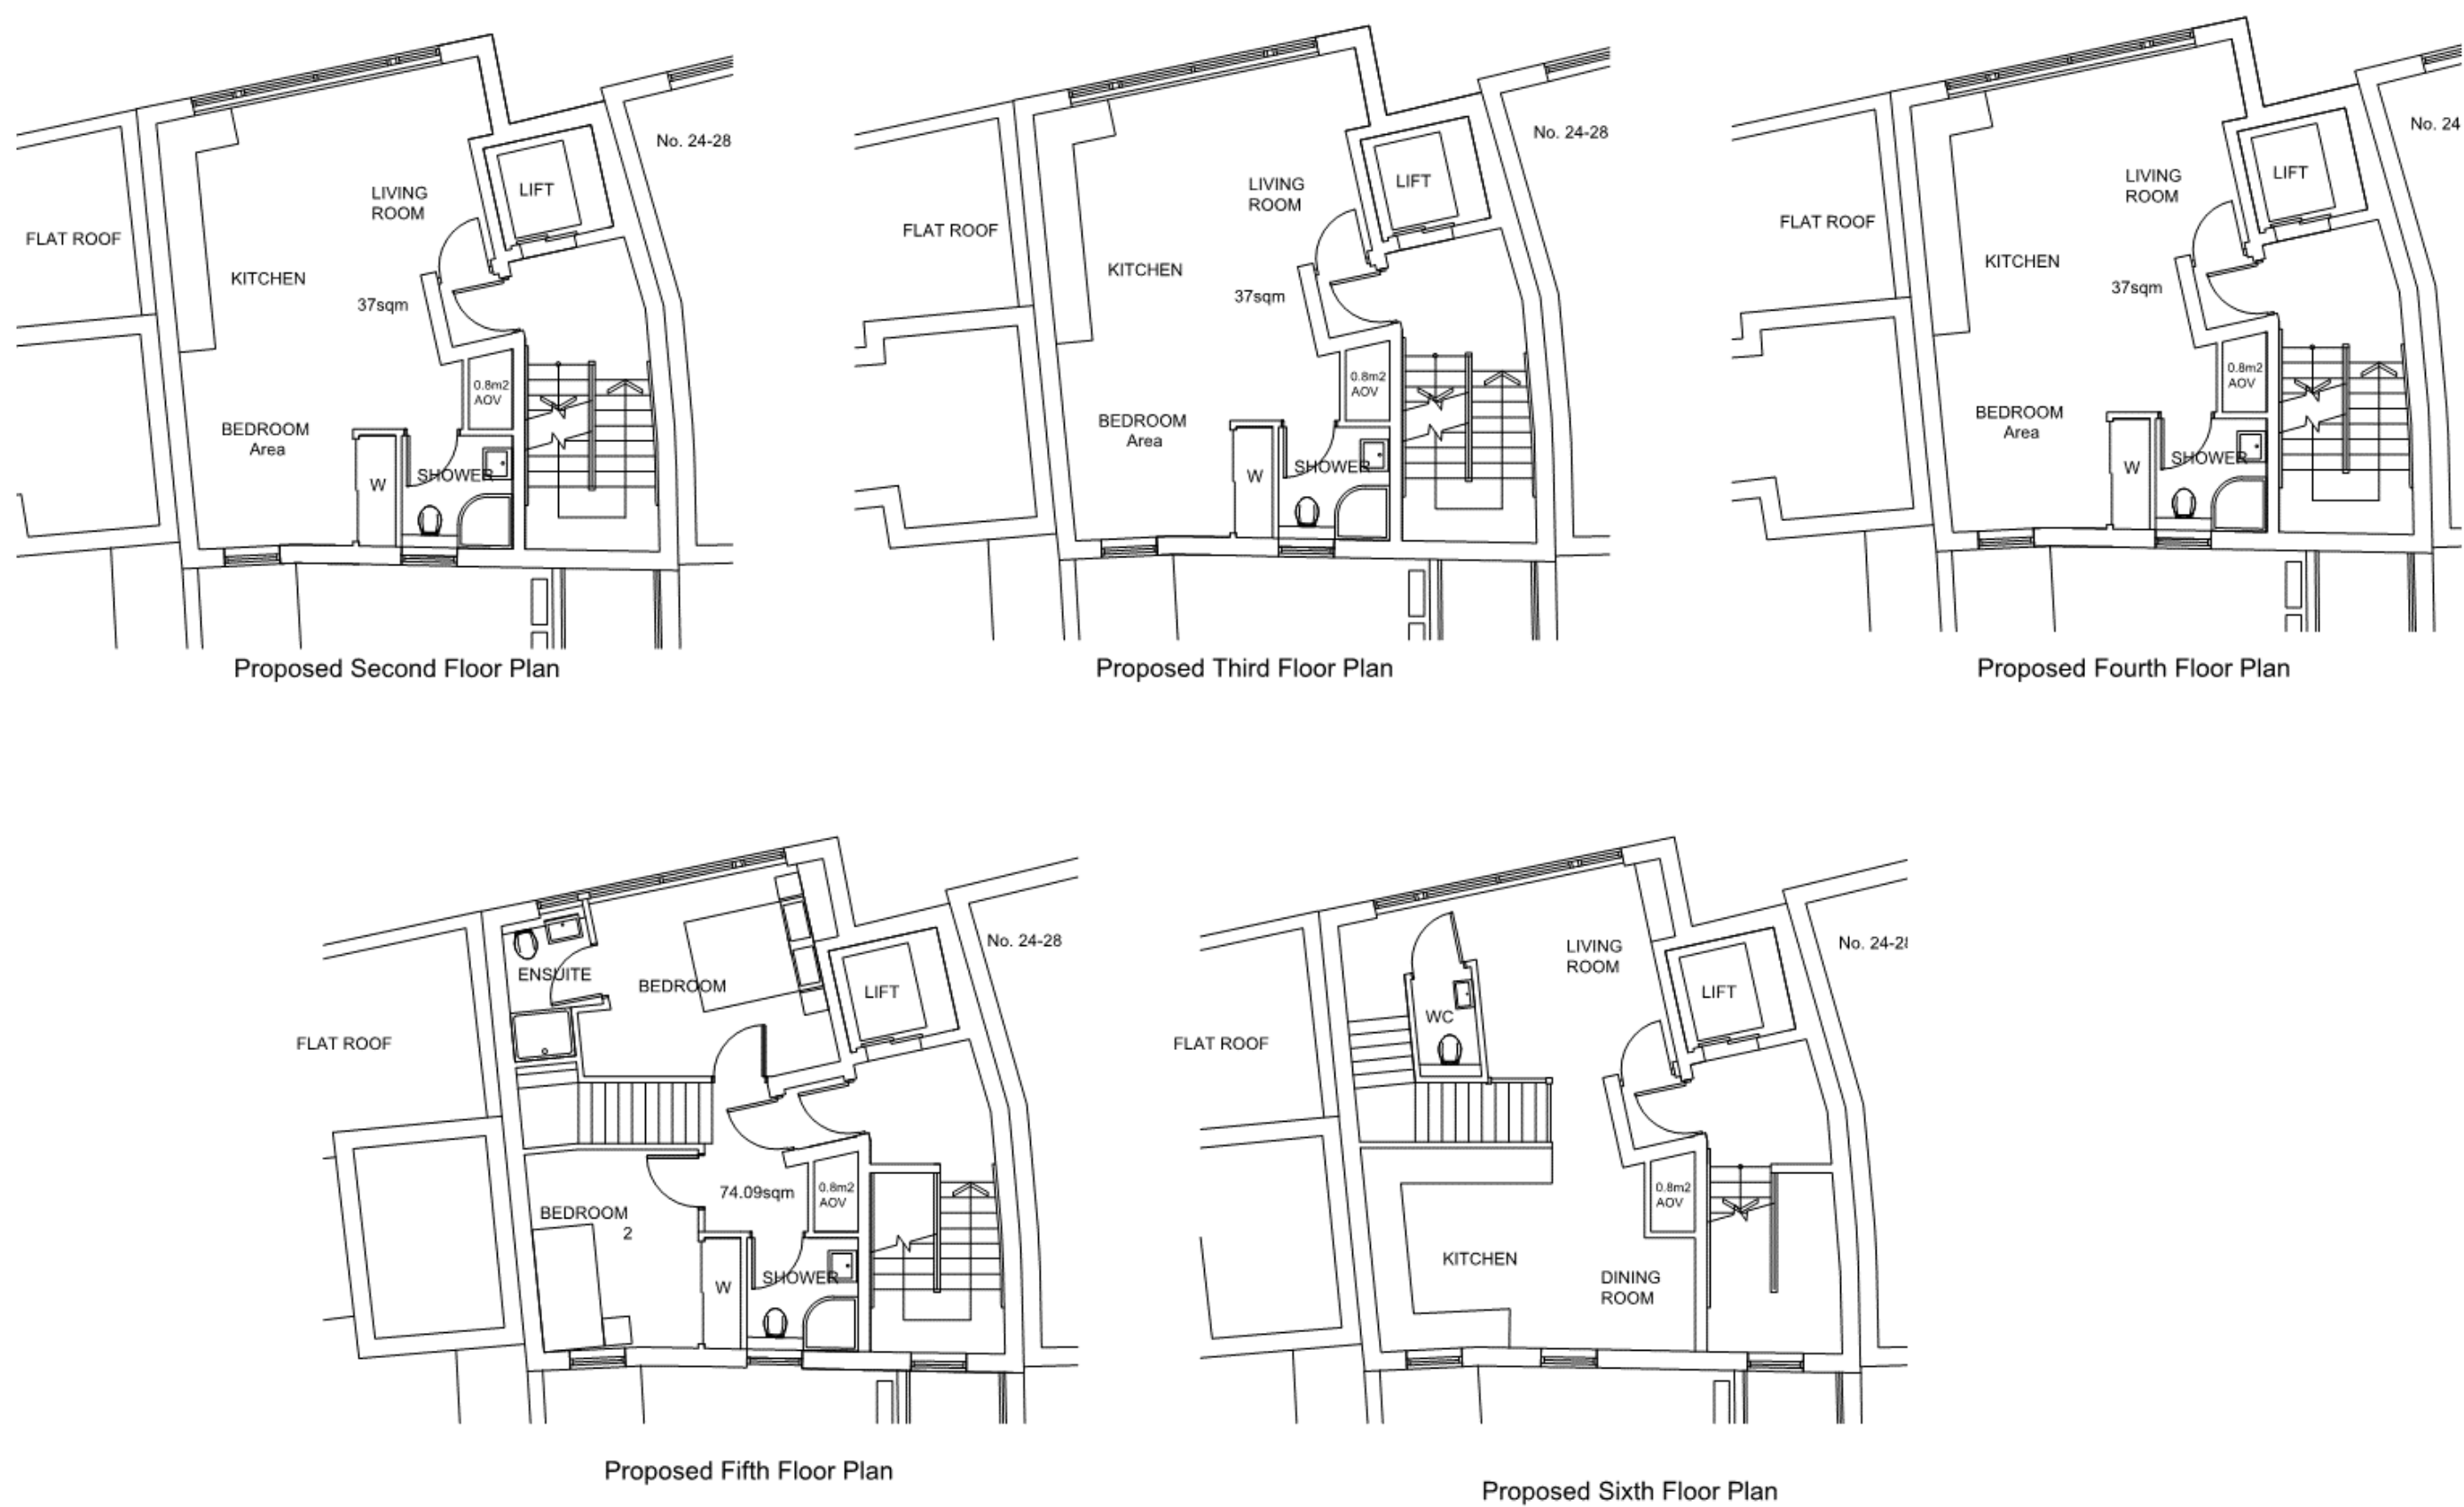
2<sup>nd</sup> to 6<sup>th</sup> Floor Layouts
